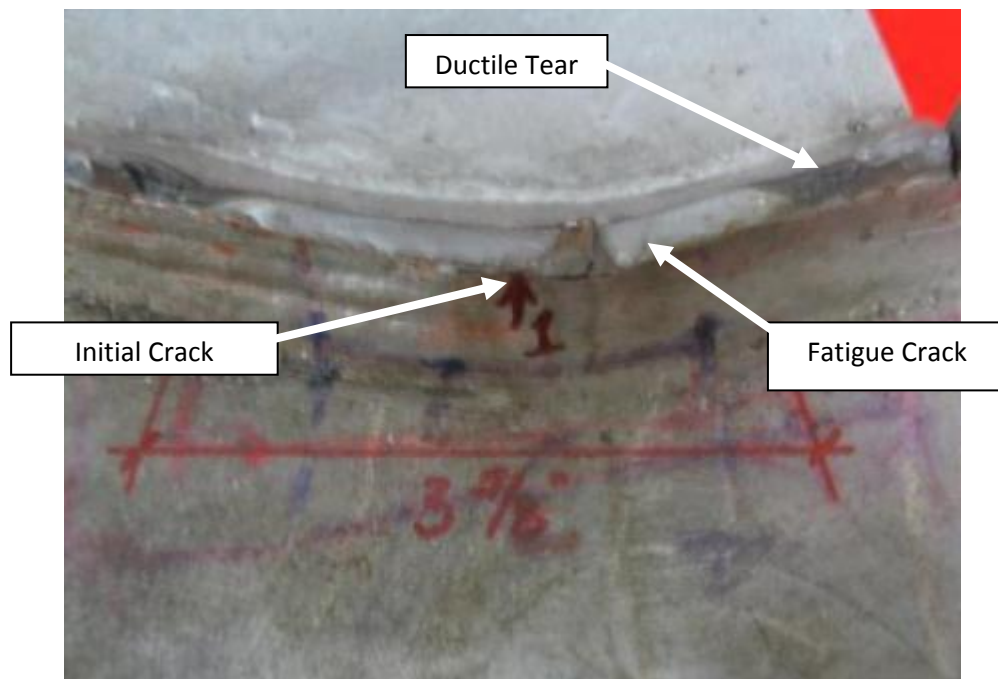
Bend 3 of Specimen 33-3-12-TX-VG-A
